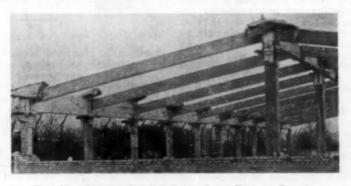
Casting In-situ Joints for a Precast Frame.
